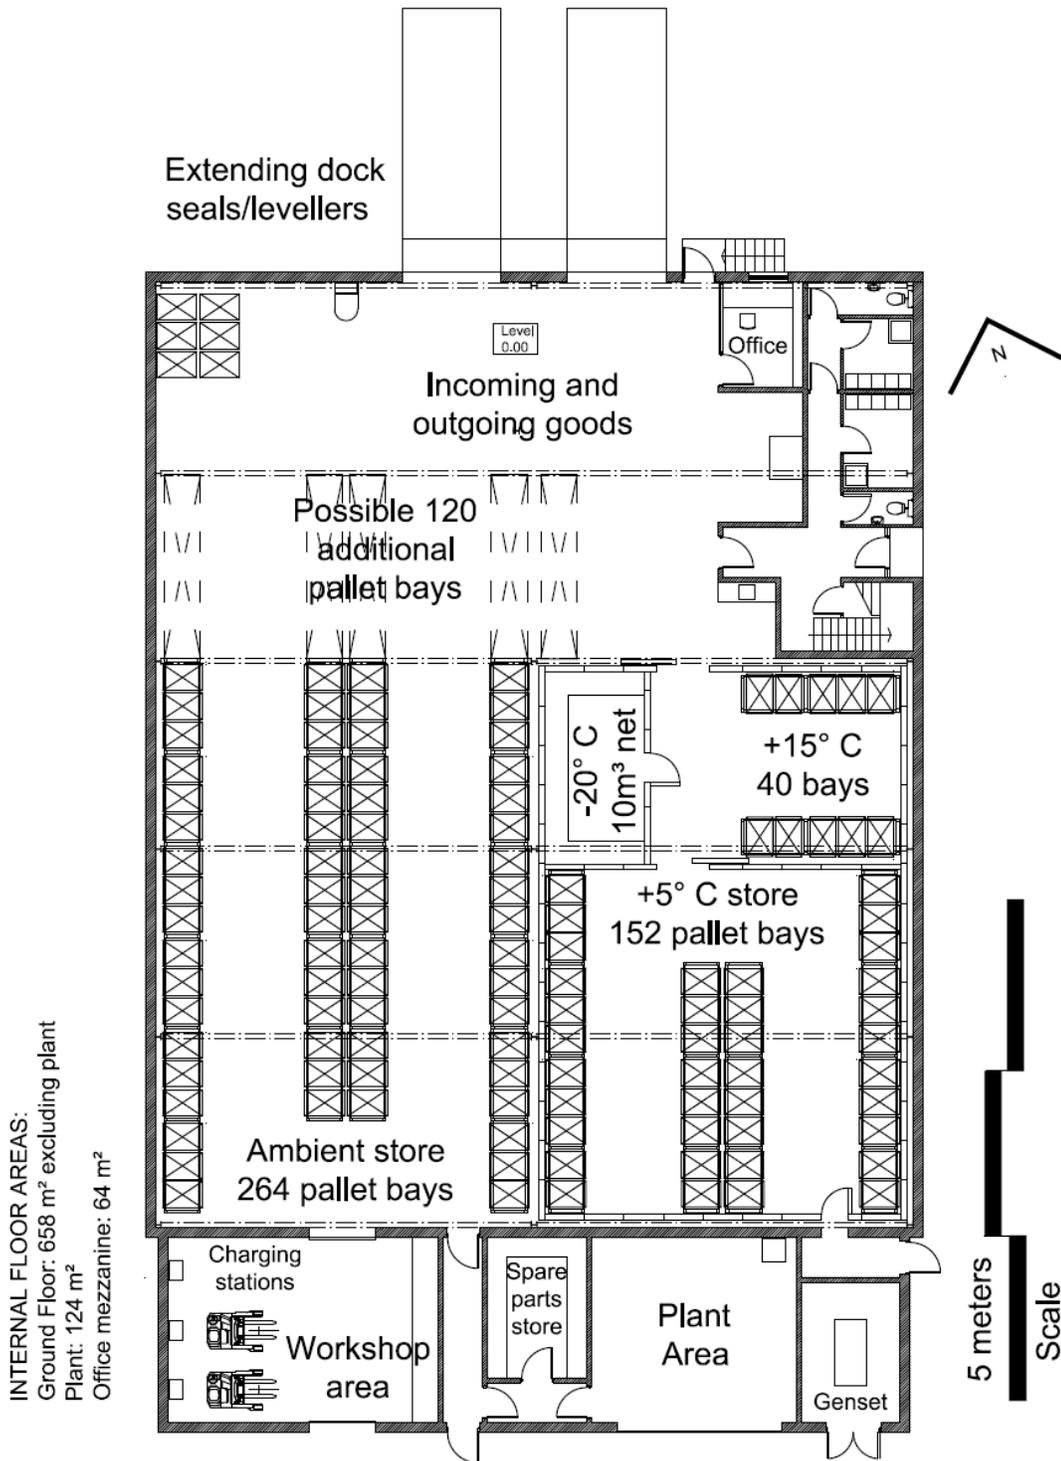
Final layout for the warehouse, ground floor; adapted from (Garnett, 2013)
